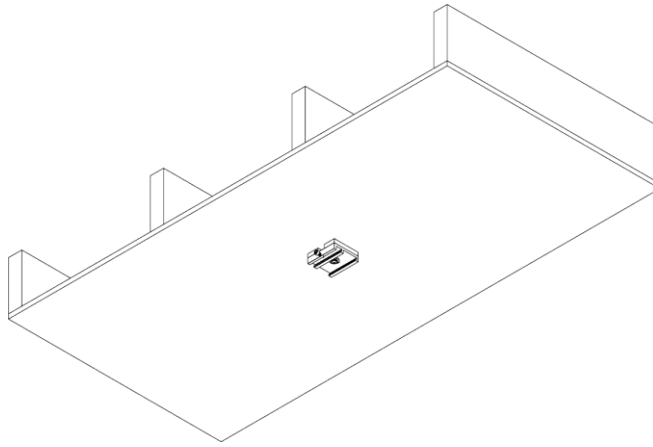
Bracket (or Shims) Tight Against the Ceiling
